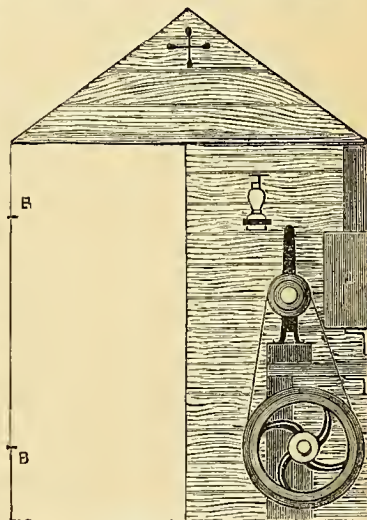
VIEW OF INTERIOR, LOOKING EAST.
